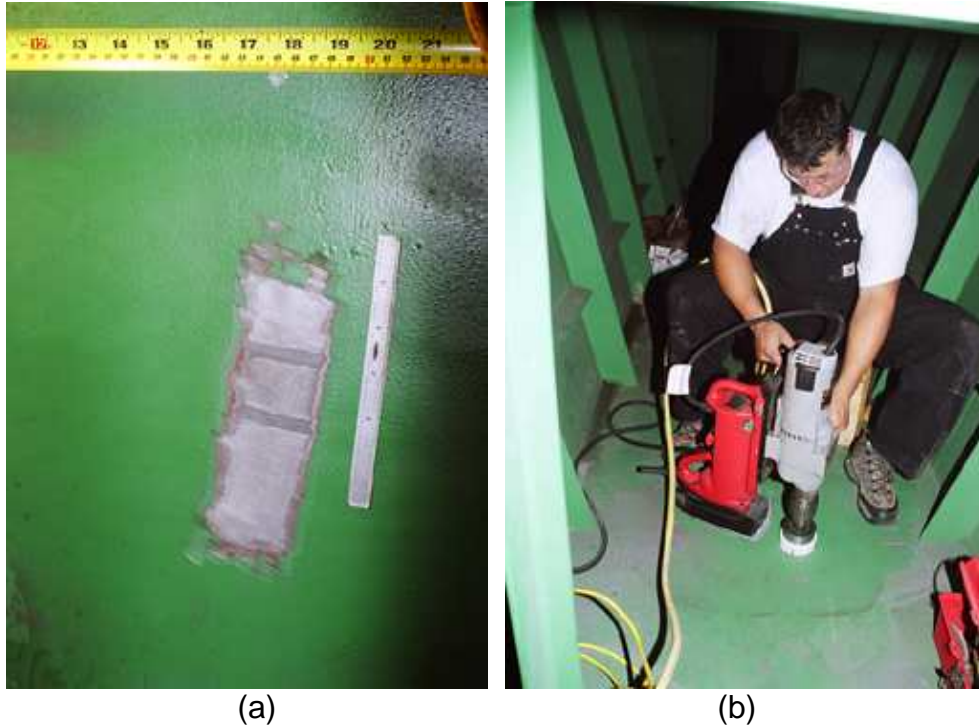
Photographs of removing core samples by (a) removing Paint and etching the steel, and (b) cutting with hole saw [Courtesy of MEI Charlton, Inc.].
